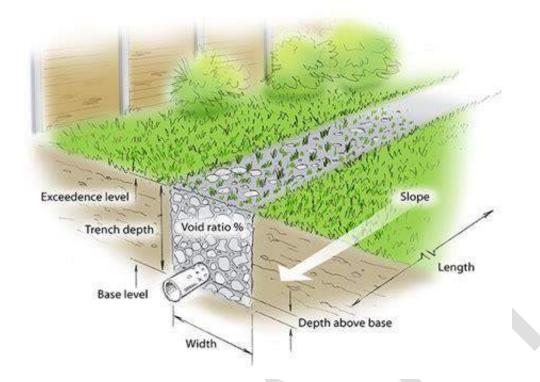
Diagram of stormwater infiltration trench system¹⁰⁹.
